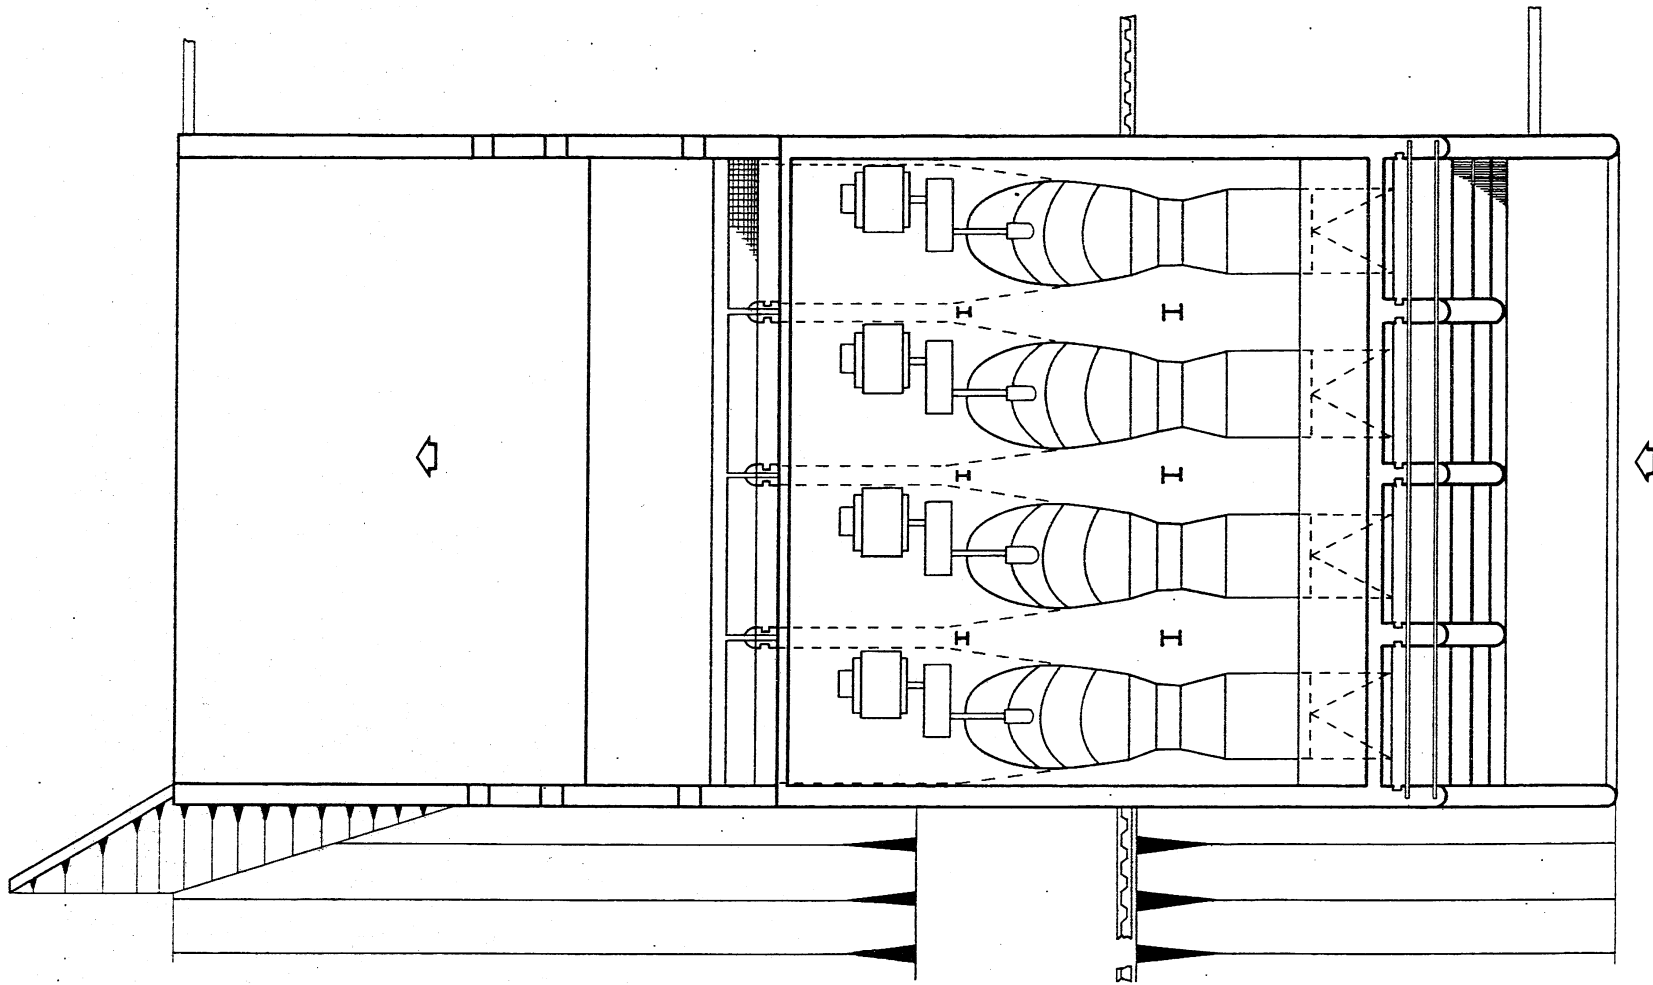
Plan Layout of Four Horizontal Tubular Units in Powerhouse.
